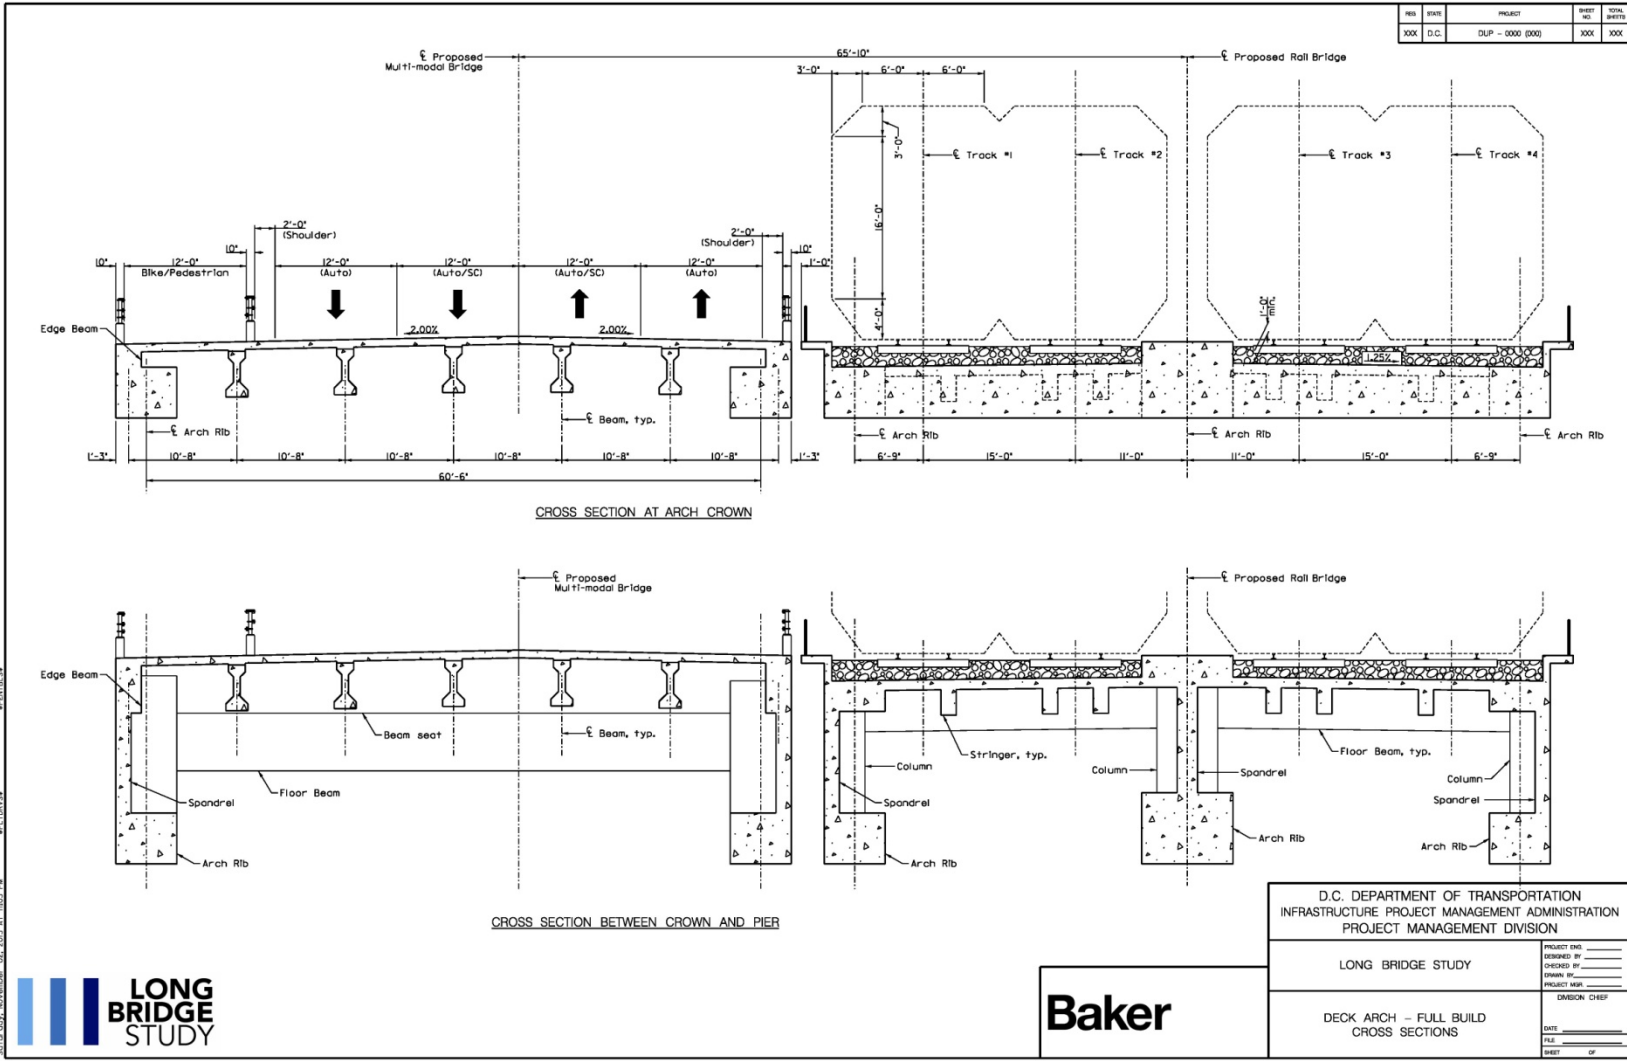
Concrete Deck Arch Cross Section - Full Build
